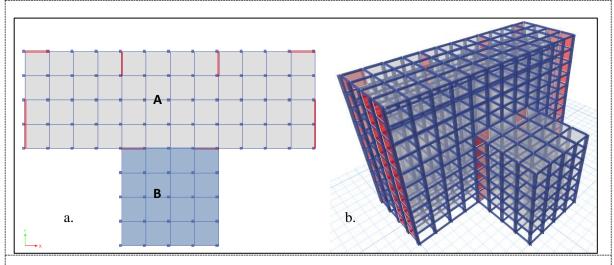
Model 4A (after shear walls were installed): a) the plan, b) 3D.
